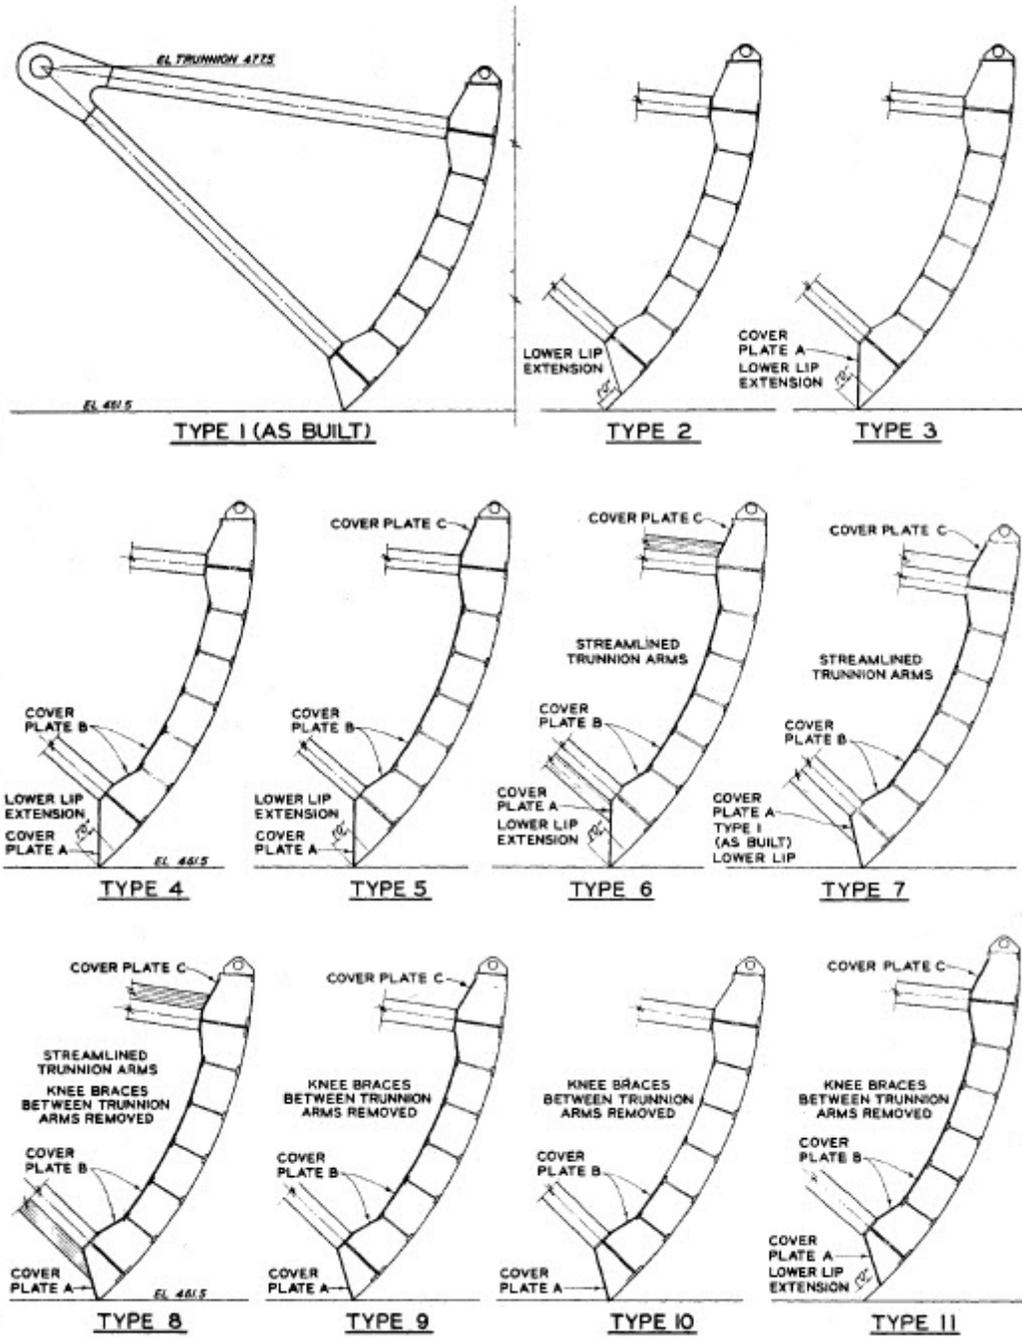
Tainter Valves, Lock No. 19, Types 1-11 Designs.
